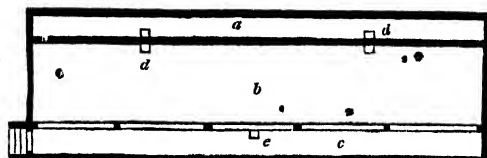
Ground Plan of a Pit to be heated in Mr. Corbett's manner.
